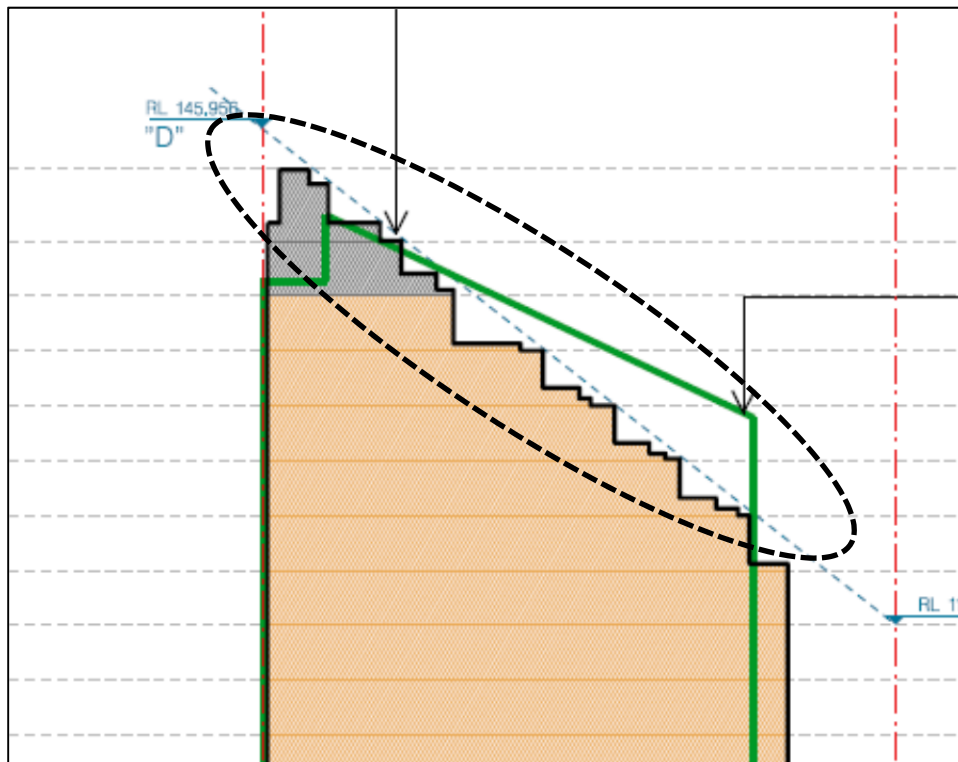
Variations to the maximum height and roof profile of the Stage 1 building envelope
